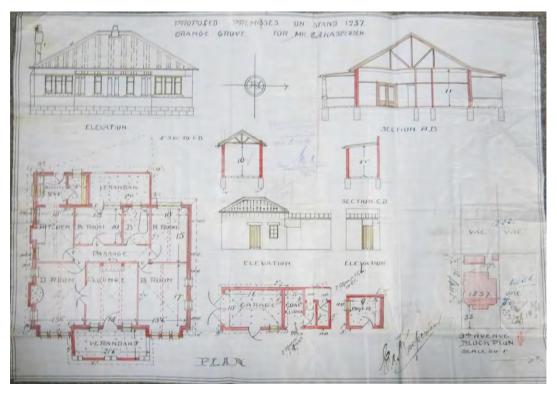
Plan for proposed three bedroomed house on the corner of Ninth Avenue and Tenth Street (Source: City Council of Johannesburg, Plans Archive)
